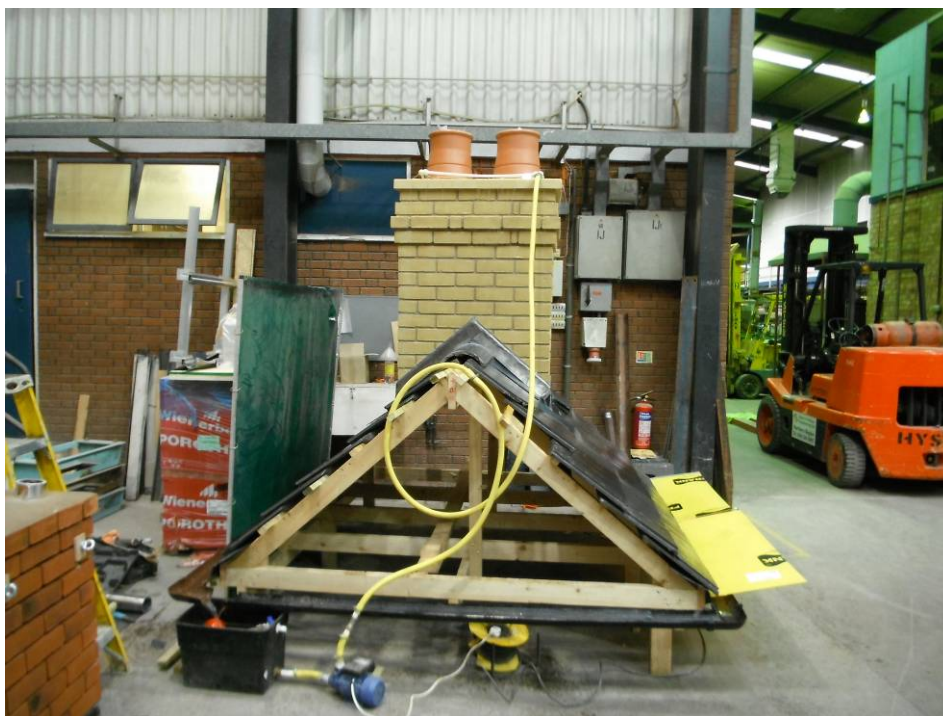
Mid Ridge Chimney under Soak Coat Water Test
